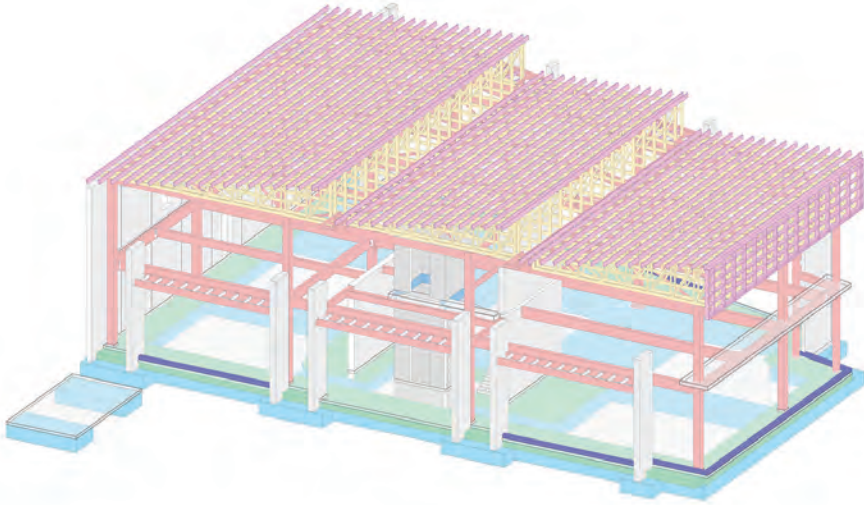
Sample of a BIM structural model used to support learning about architectural form and structure.
